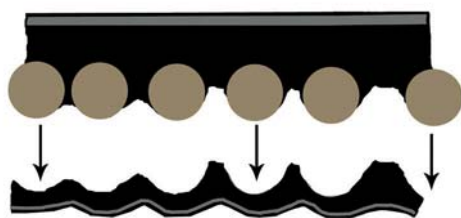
Collapse of lower plasterwork following junctions between ceiling joists.
